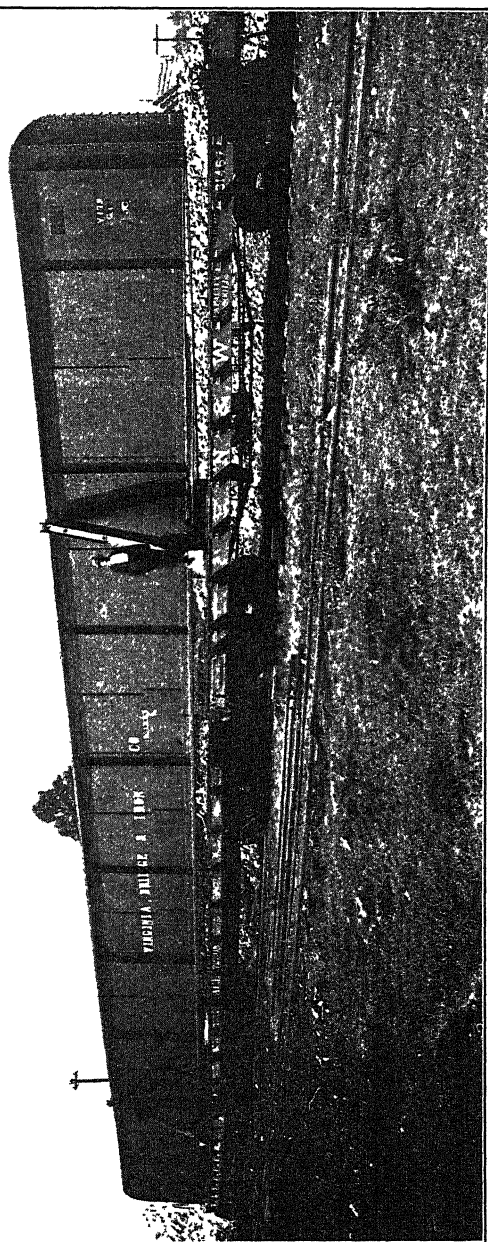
Single large plate girder secured to flat cars for shipment. (Courtesy of Virginia Bridge & Iron Co., Roanoke, Va.)
